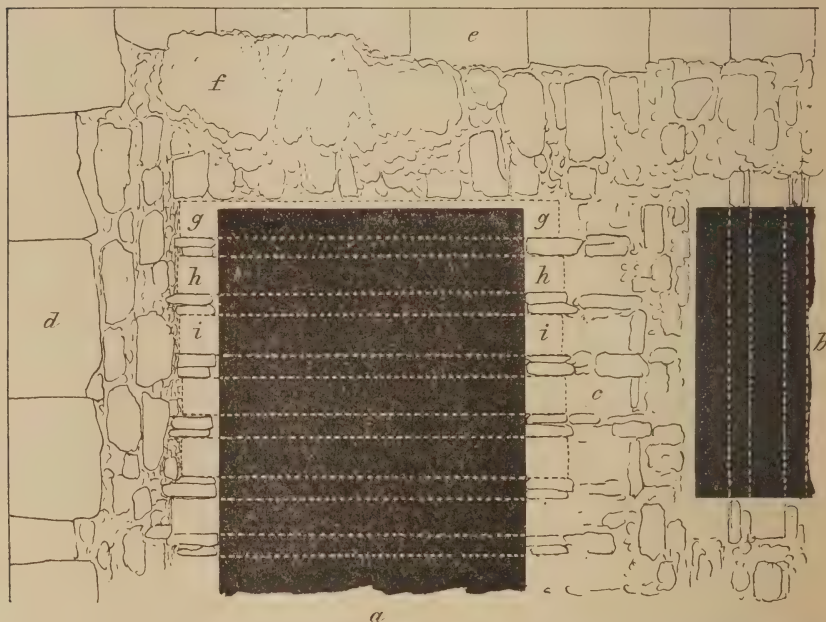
PLAN OF NORTHWEST CORNER OF QUADRANGLE OF THE GRECQUES, SHOWING THICKNESS OF WALLS AND PLACEMENT OF CEILING BEAMS.
